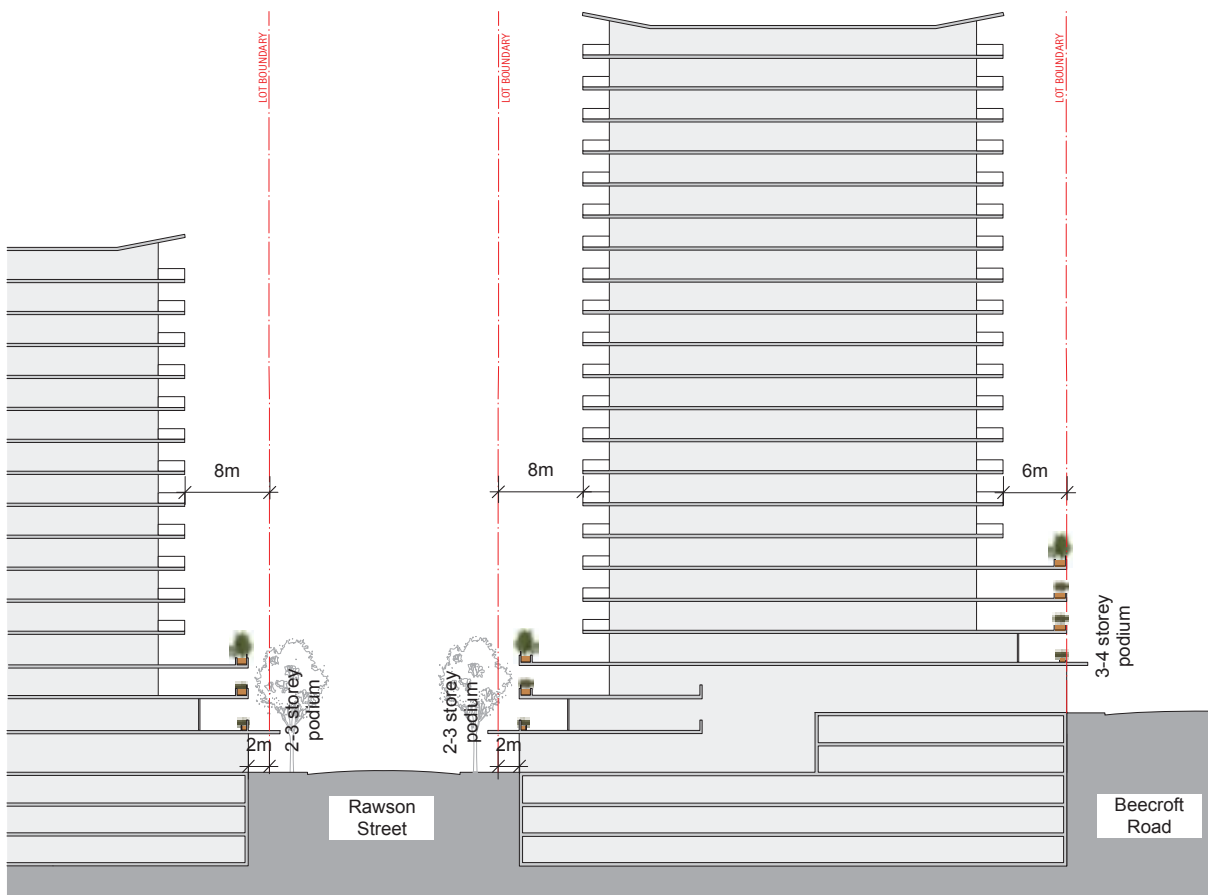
Setbacks to Rawson Street and Beecroft Road
